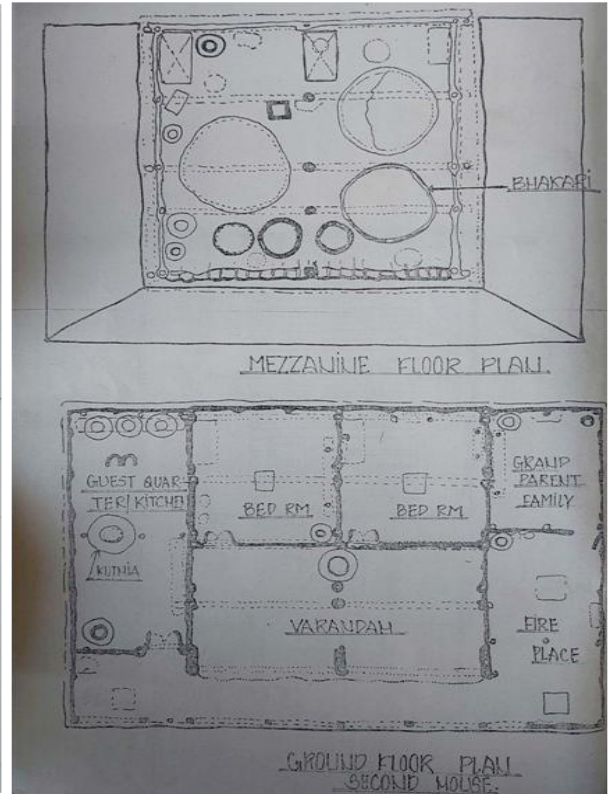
Ground Floor Plan and Mezzanine Floor Plan of Bangla House
